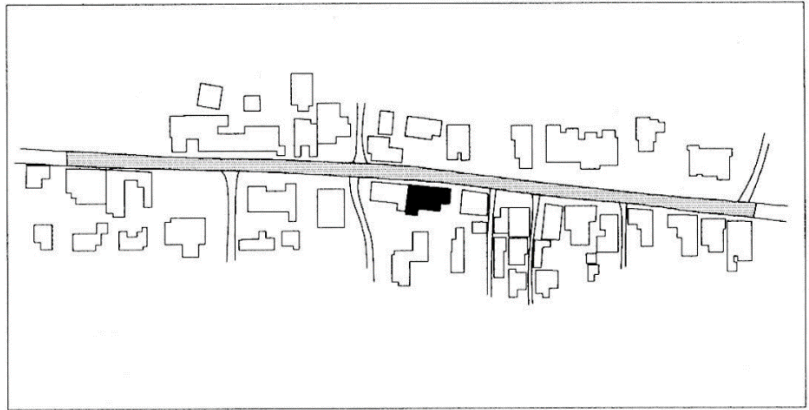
Linear Street – No Interruptions or Truncation
